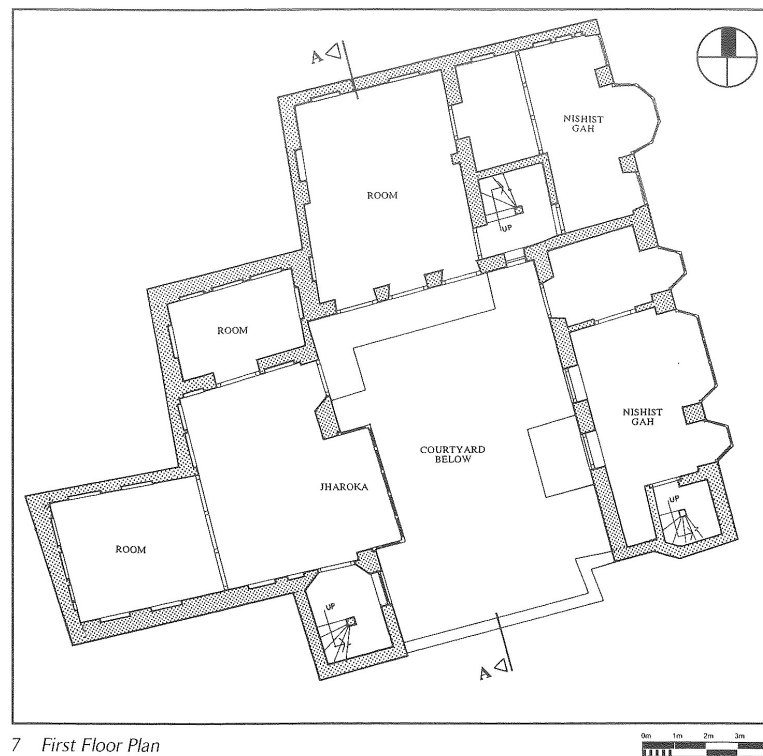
First Floor Plan of Haveli in Lahore Mandi Bazaar.
